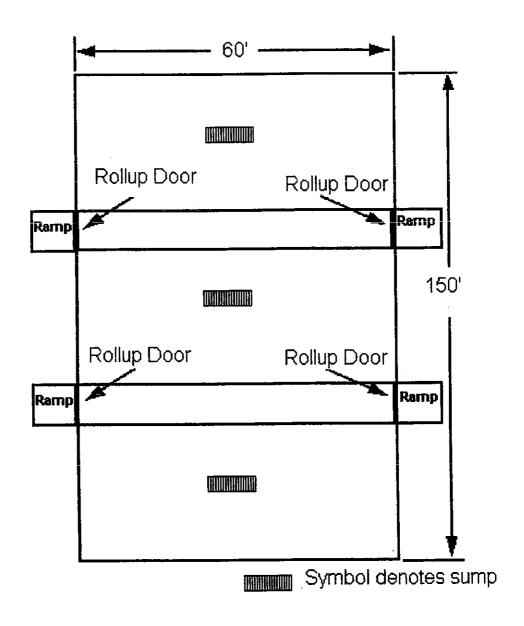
(Proposed) TRU Storage Facility, Building 7577.
